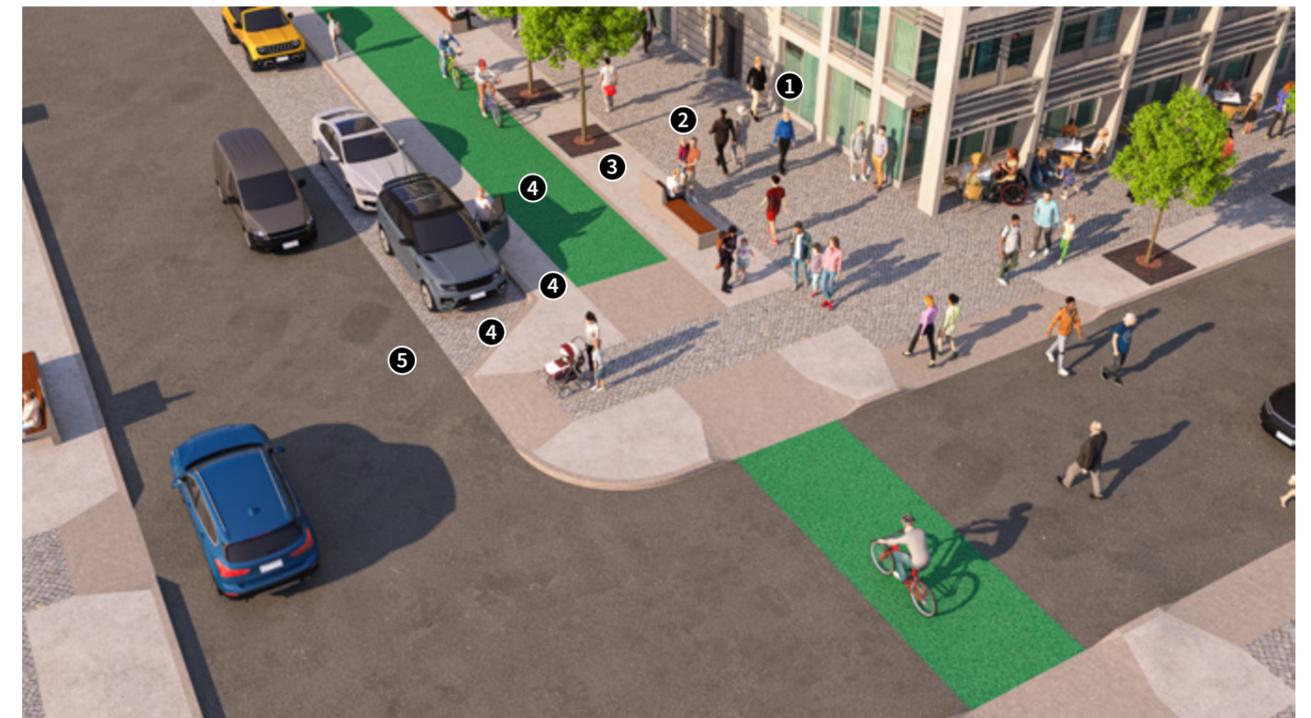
Urban street zones [adapted from the Urban Streets and Road Design Guide (Auckland 2022)]
